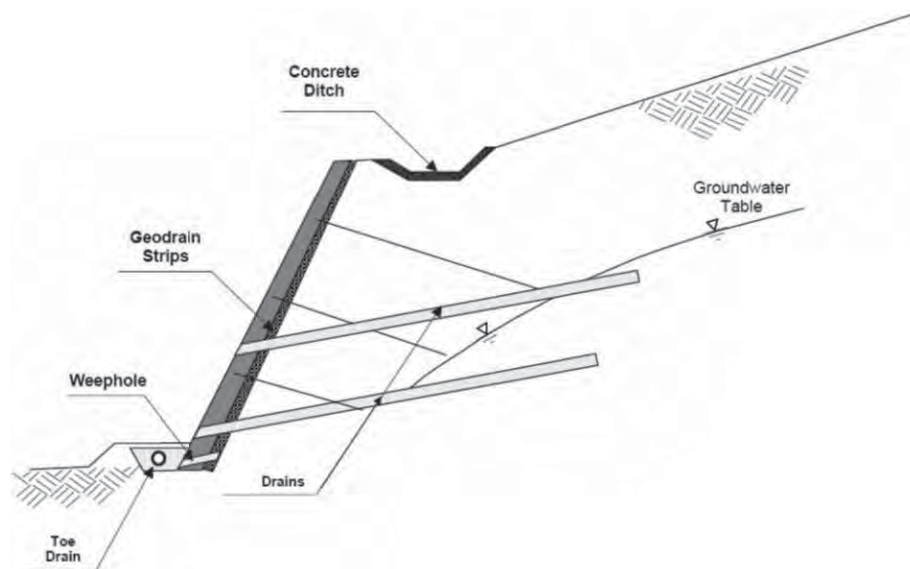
Typical drainage of soil nailed wall (Lazarte et al. 2003).
